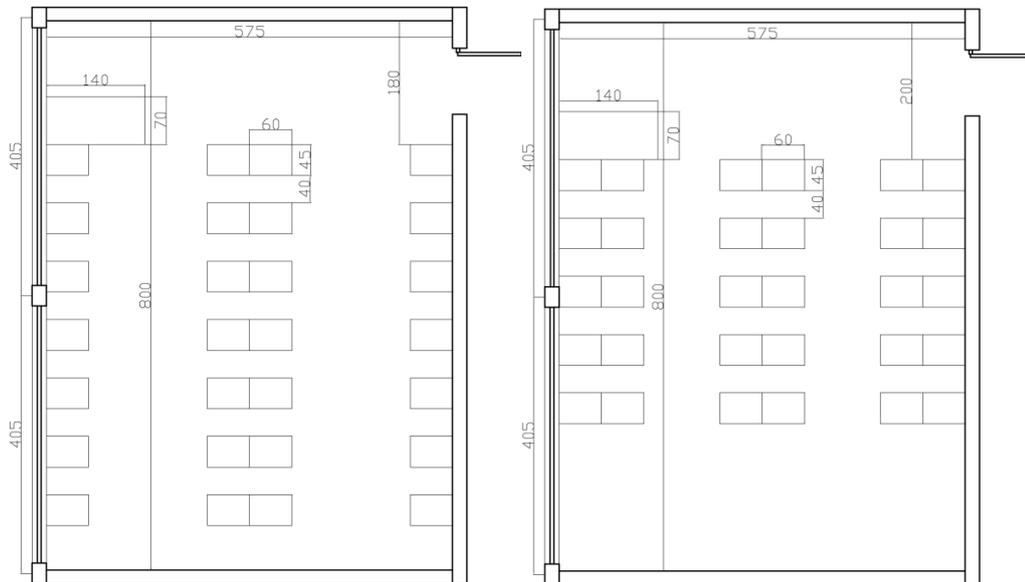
Floor Plans of the Classrooms Facing North-West (Left) and South-East (Right) of the School Building Located in Çankaya District of Ankara (Produced by the Author)
